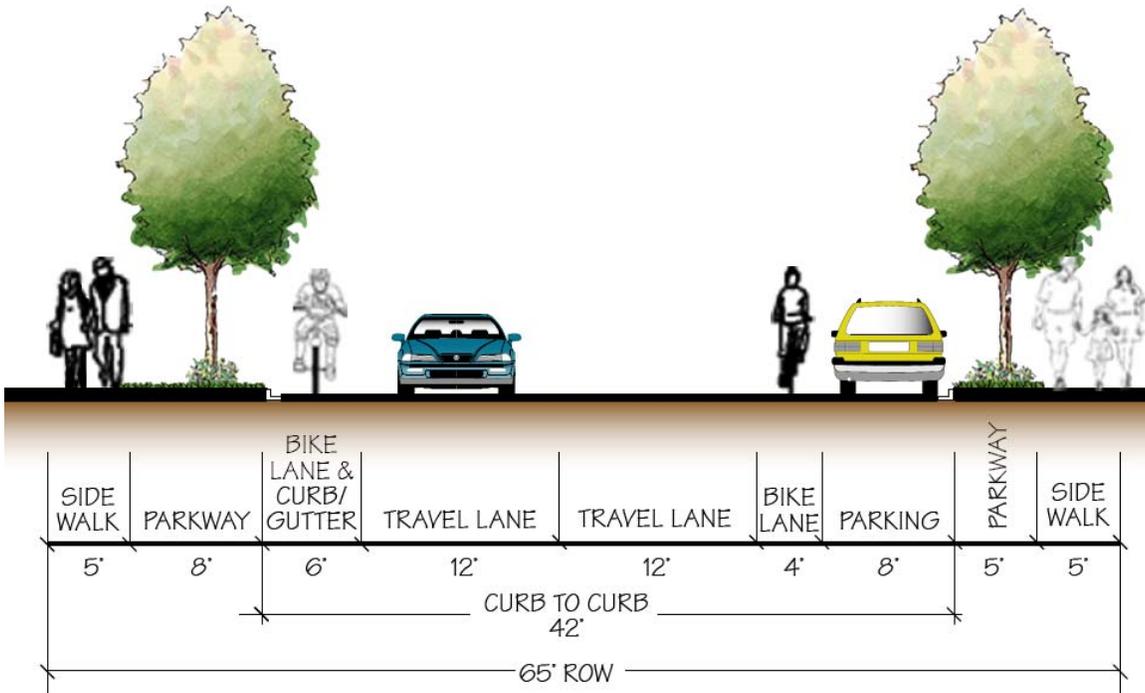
Herdal-Werner Connector Segment 1 (Section A-A from Figure 5-1)
